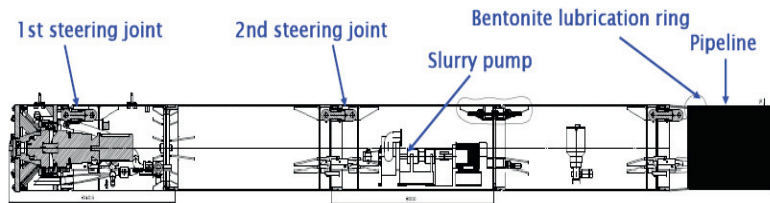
The setup of micro-tunnel boring machine and the steering joints
